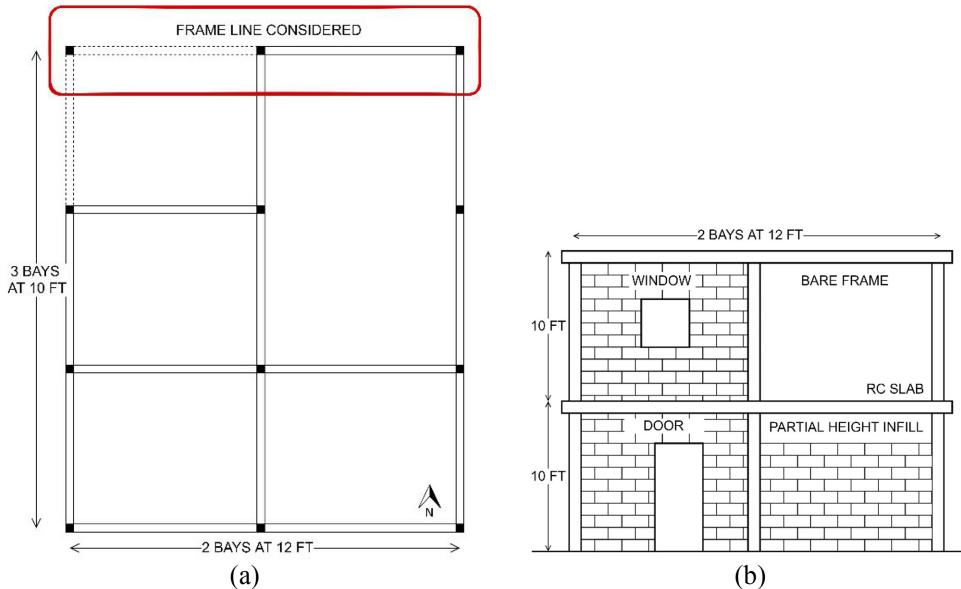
Floor plan and elevation views for archetype houses. The infill/opening configuration and the number of stories are two of the characteristics varied. [1 ft = 0.3 m].
